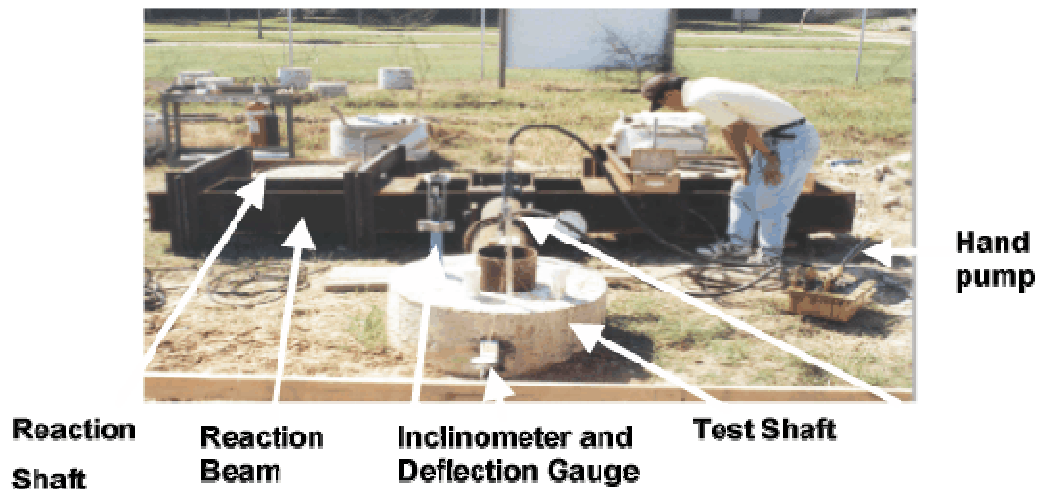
Test Setup for a Conventional Load Test (Source: <http://www.fhwa.dot.gov/infrastructure/tccc/tutorial/shafts/fhcha10.htm>)
